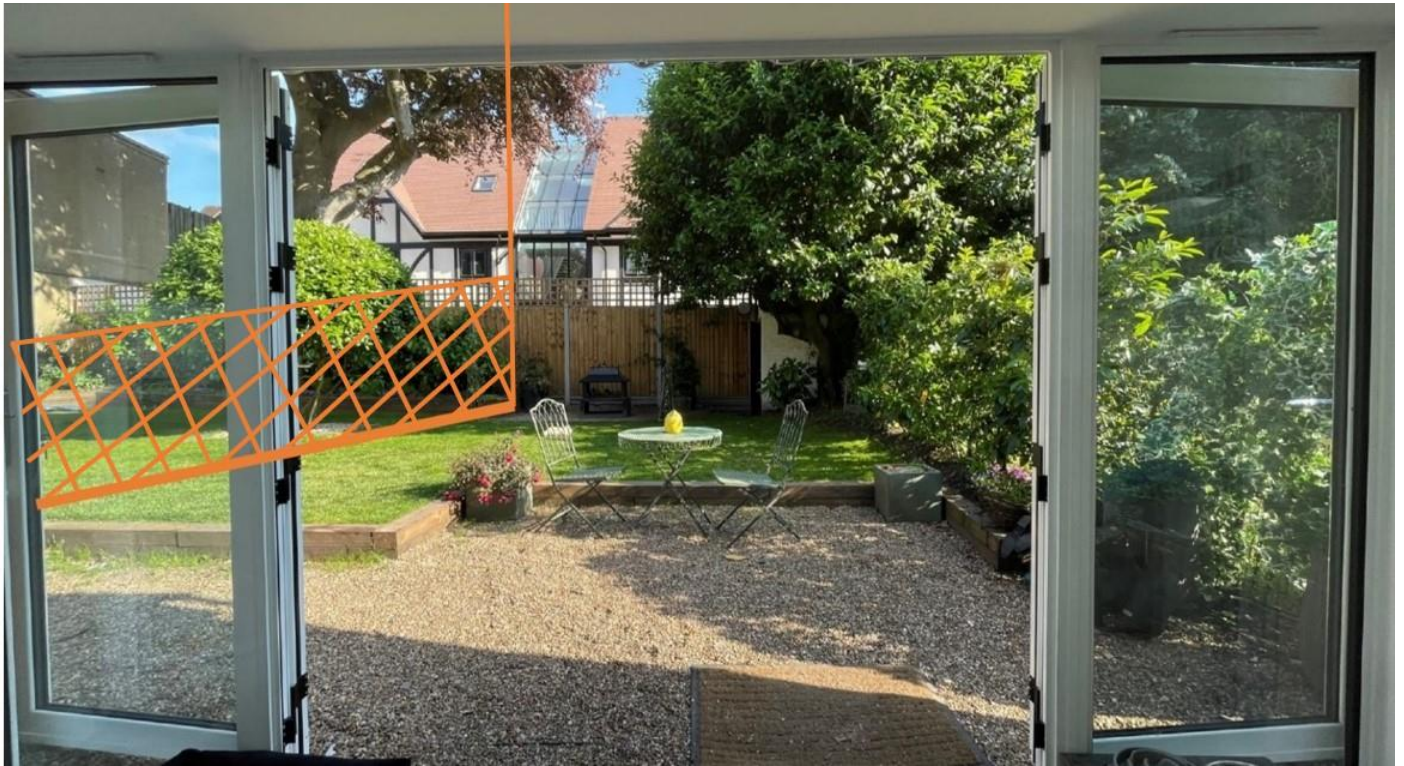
Proposed garden for the new detached dwelling. Boundary line between the proposed and existing for no:1 Wildes Cottage shown in orange.
